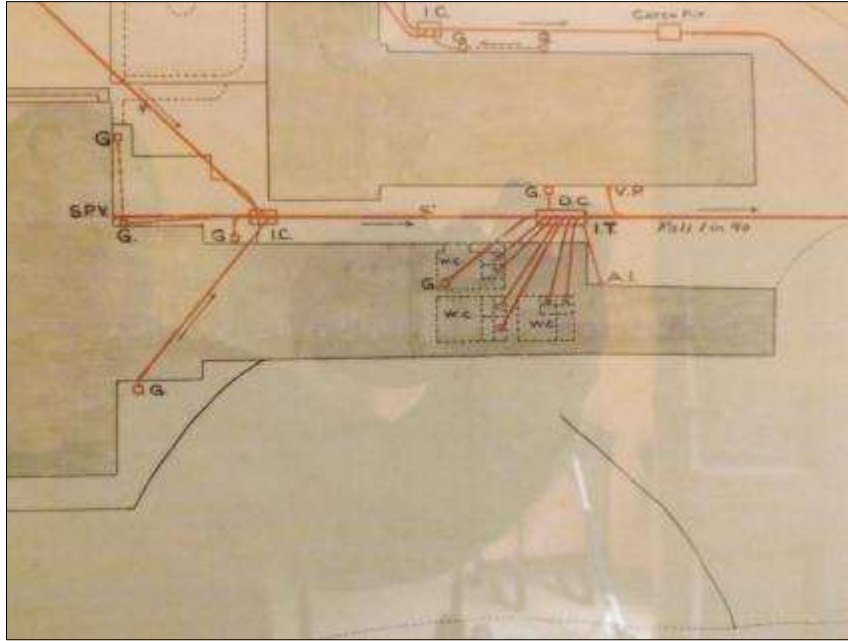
The 1902 new drains plan; Scullery sink appears to drain at G (centre)
